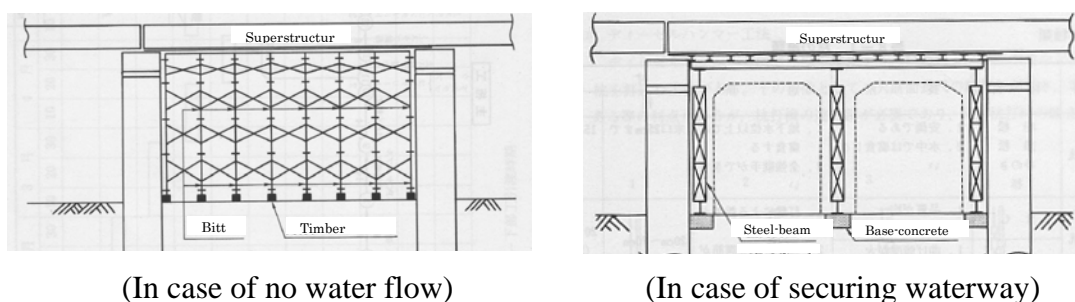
Staging Method with Support for RC Hollow Slab Construction
